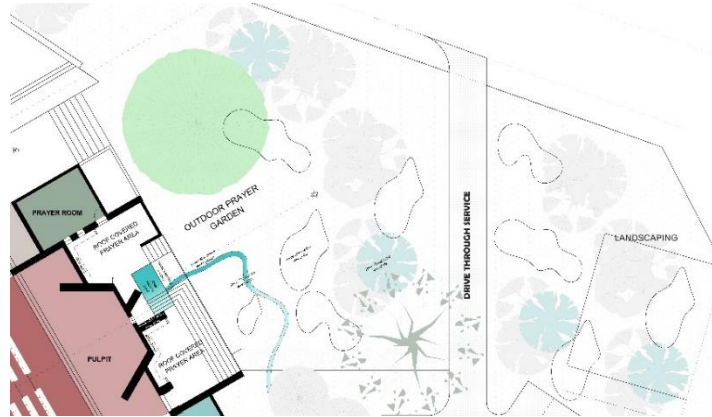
Part floor plan, Lower level. (Author 2021).
